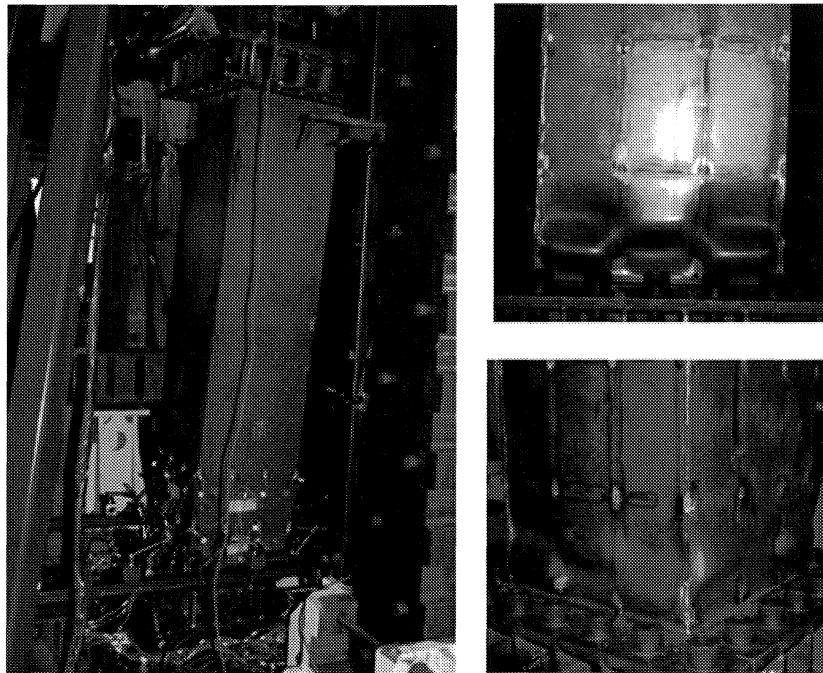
Failures of specimen observed after static cyclic loading (S1)
